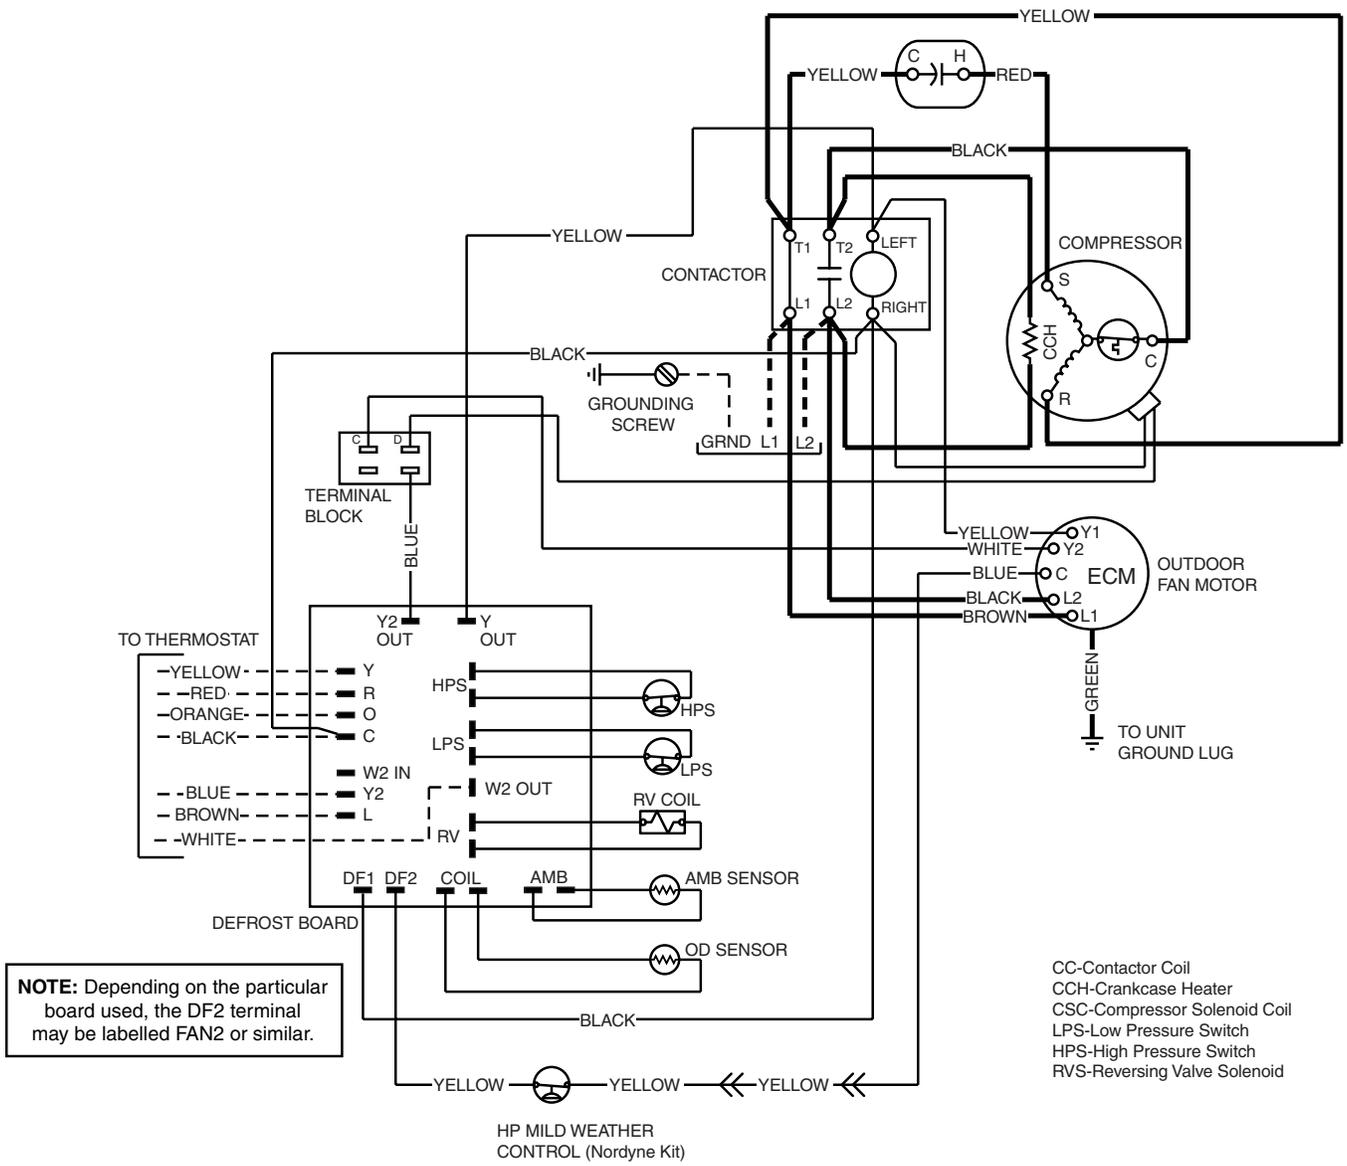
Field Wiring Diagram for Mild Weather Control Kit (Heat Pump with ECM Outdoor Fan Motor - 14 SEER Units)
